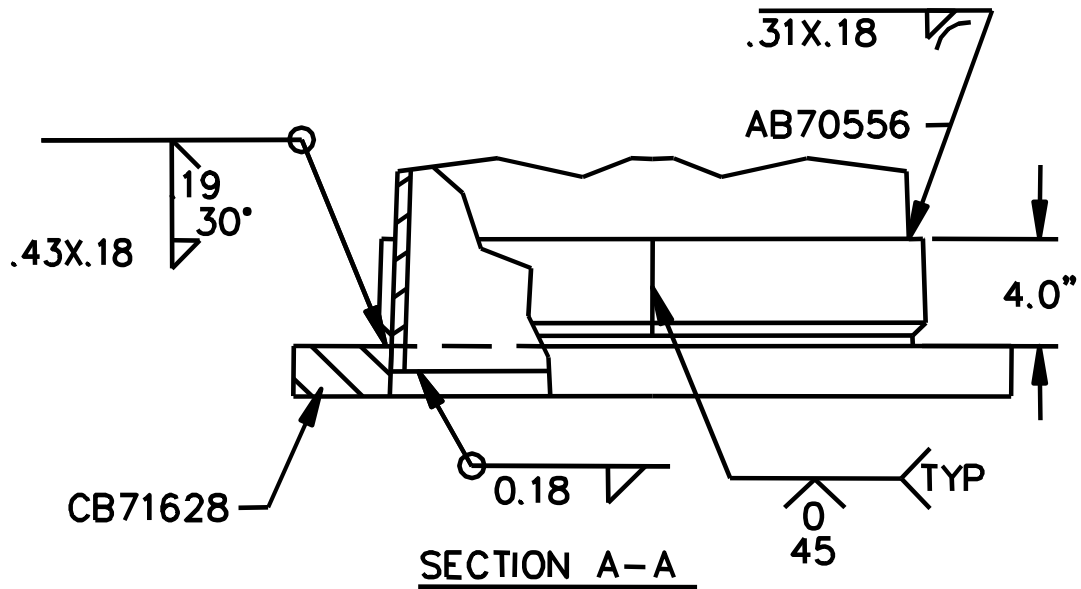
External Collar Connection Detail (Koenigs et al., 2003)
